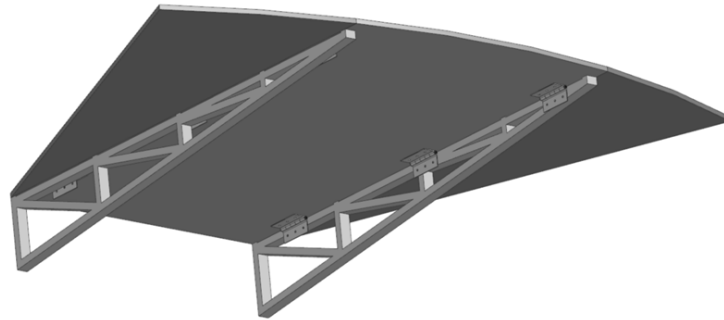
Position of truss when fully deployed. The trusses sit in between the hinged section of the floor panel, providing support to both. (Created by Mason Hoene)
